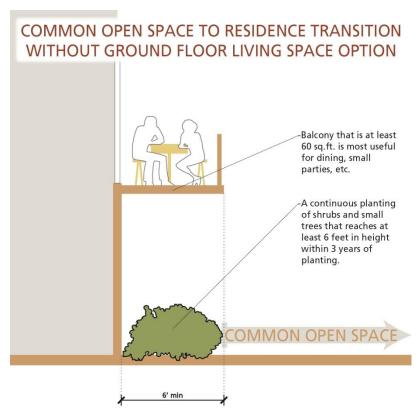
Planting requirements for residences without a ground floor living space fronting a common open space.
